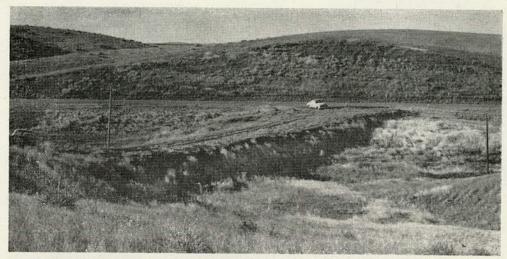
Earth buttress fill to prevent sliding. Earthfill constructed as buttress between highway embankment and opposite stable valley wall; culvert placed in creek channel under buttress. This particular installation (4 miles west of Pierre, S. Dak.) was for slide correction, but similar buttress fills are frequently constructed for prevention of slides. The horizontally bedded soft shale on far hill was moving down slowly and causing displacement of the highway fill toward the observer. (Photograph by D. J. Varnes, U. S. Geological Survey)
